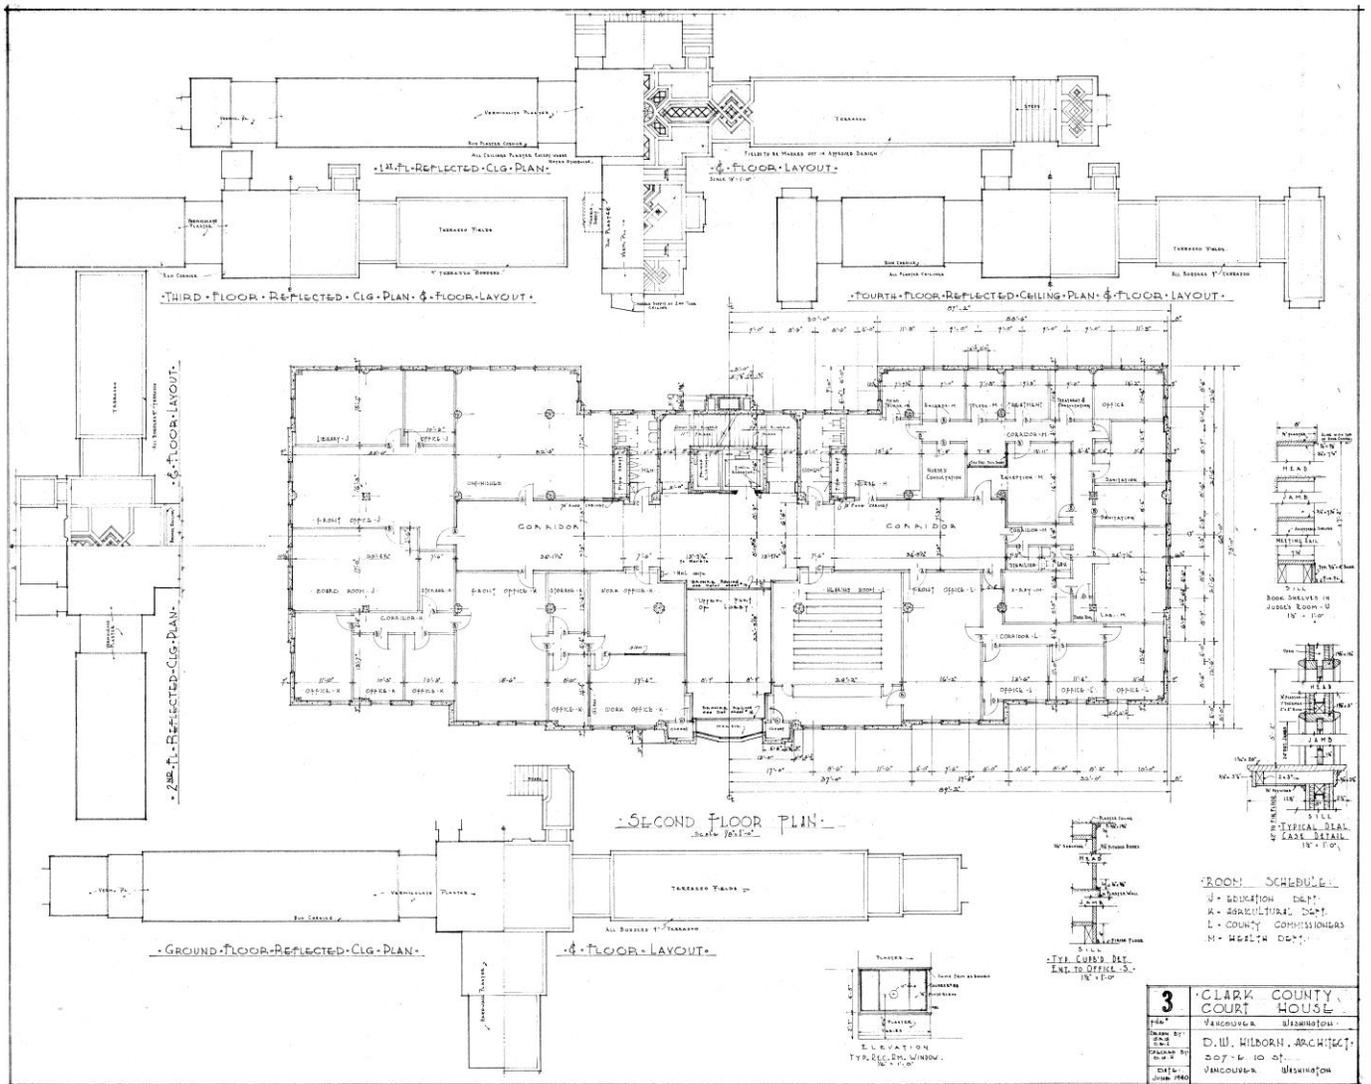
Courthouse Floor Plan Drawing – Second Floor
